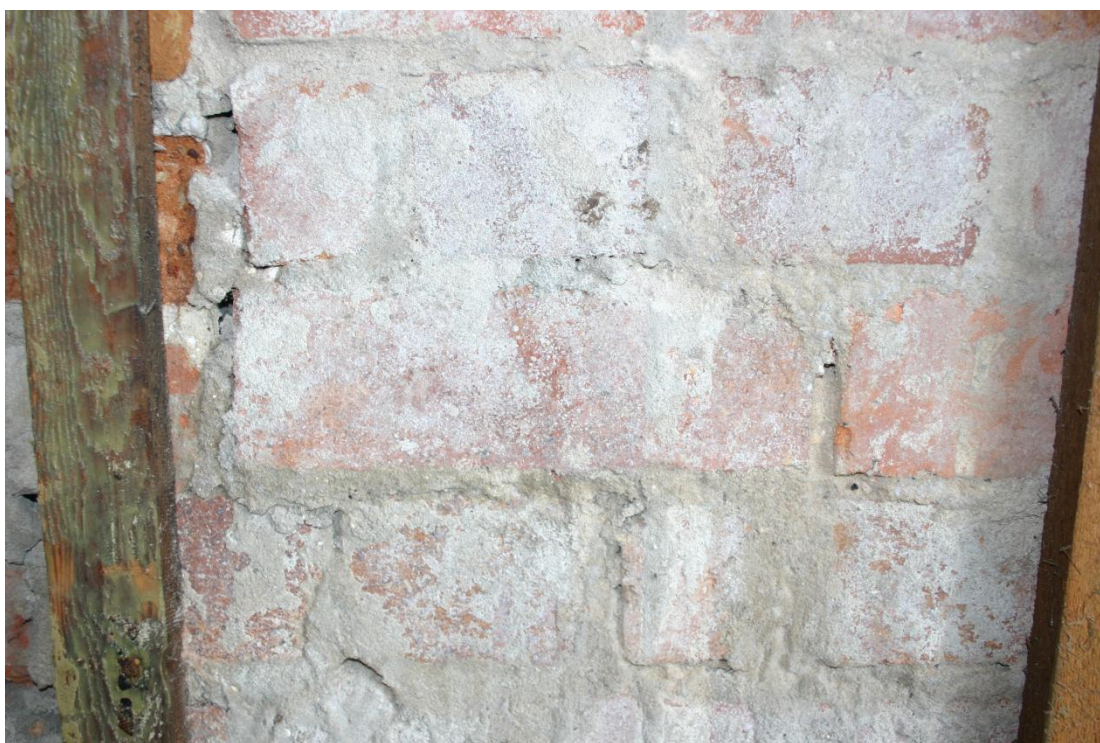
Dry-pressed brick (73x232mm), with cement bonding. Note join at left. West room.
